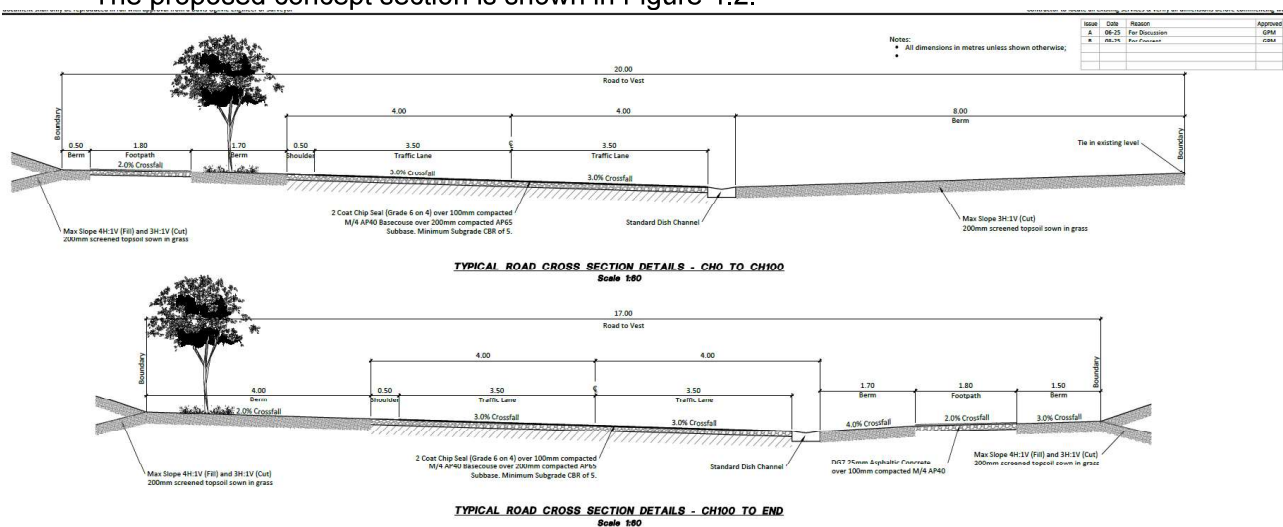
Concept section of road between Lots 5-16. (Source: Innate Landscape Architecture).
